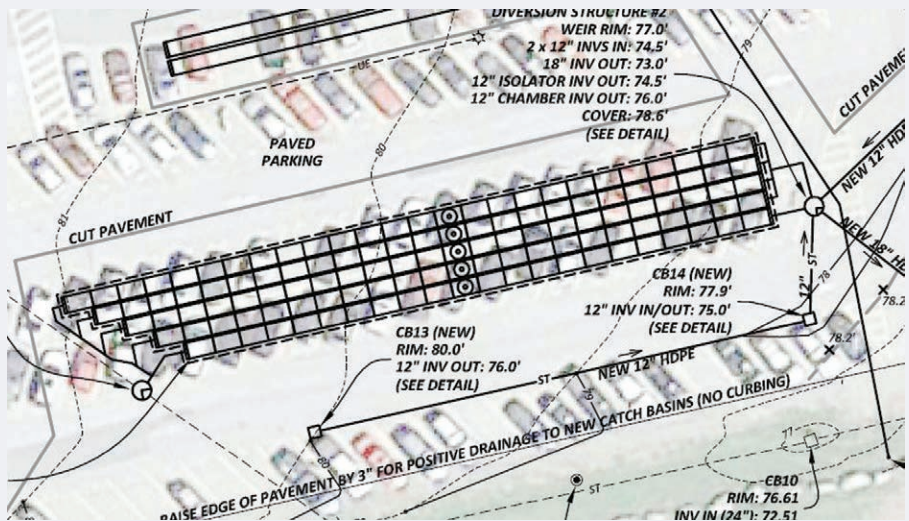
CS-7-2. Plan view of the final design for the underground storage chamber system.
